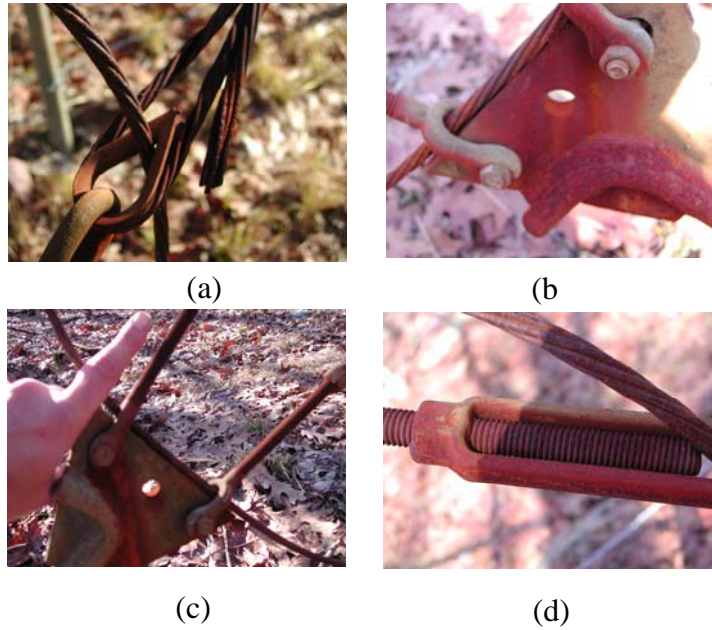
Details of guy and guy anchor condition for an anchor on Taum Sauk tower: (a) significant corrosion of guy cable at cable/anchor connection; (b) and (c) corrosion staining on gusset plate; (d) corrosion on tensioning system.
